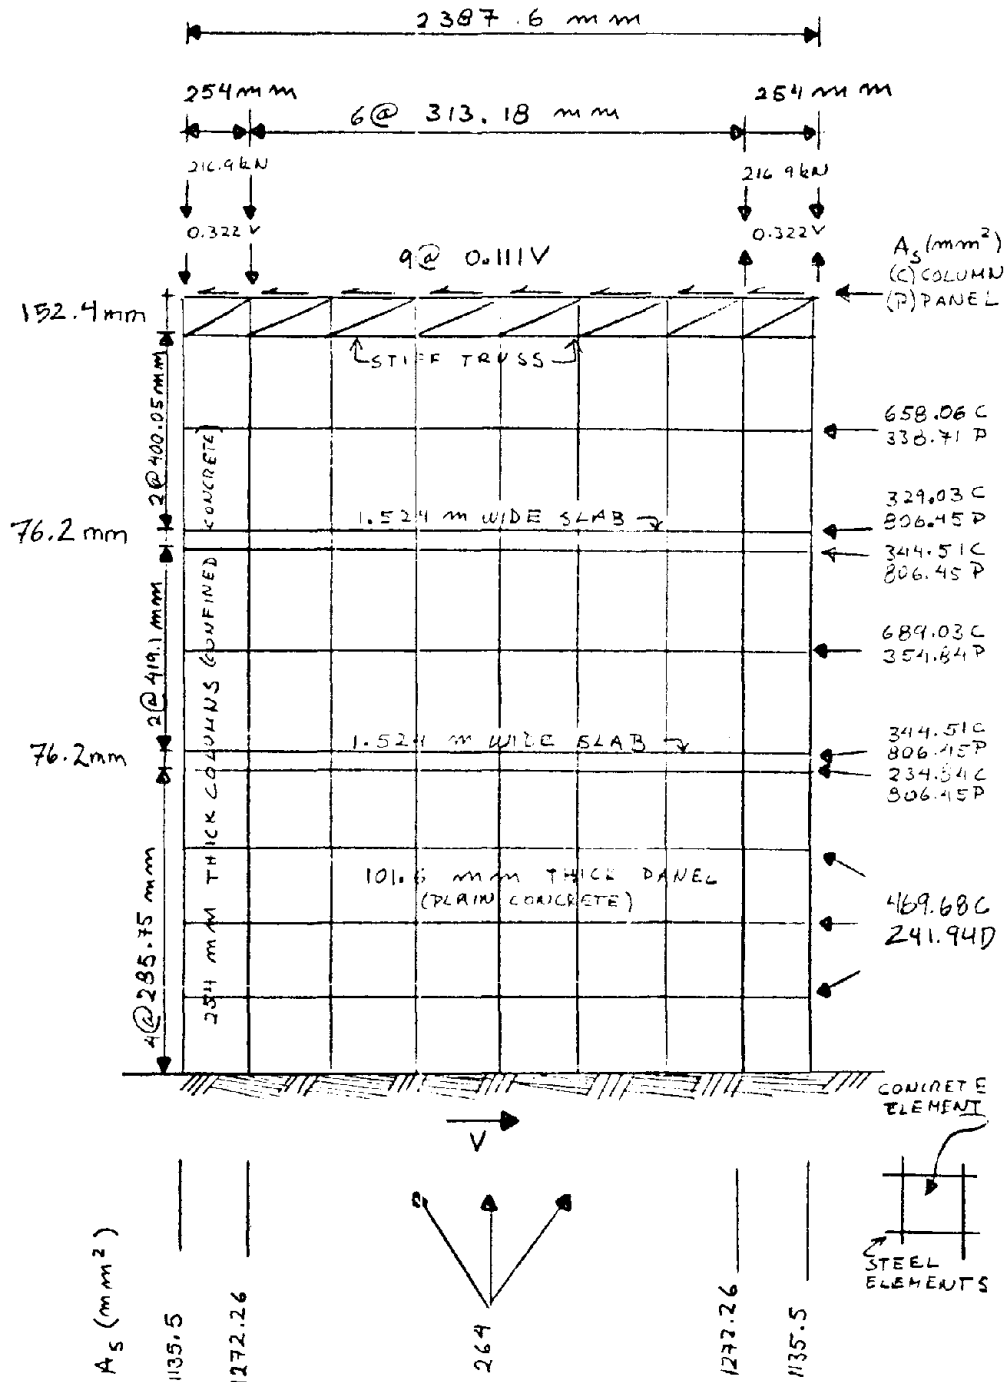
Finite Element Modelling of Framed Wall for Monotonic Loading
